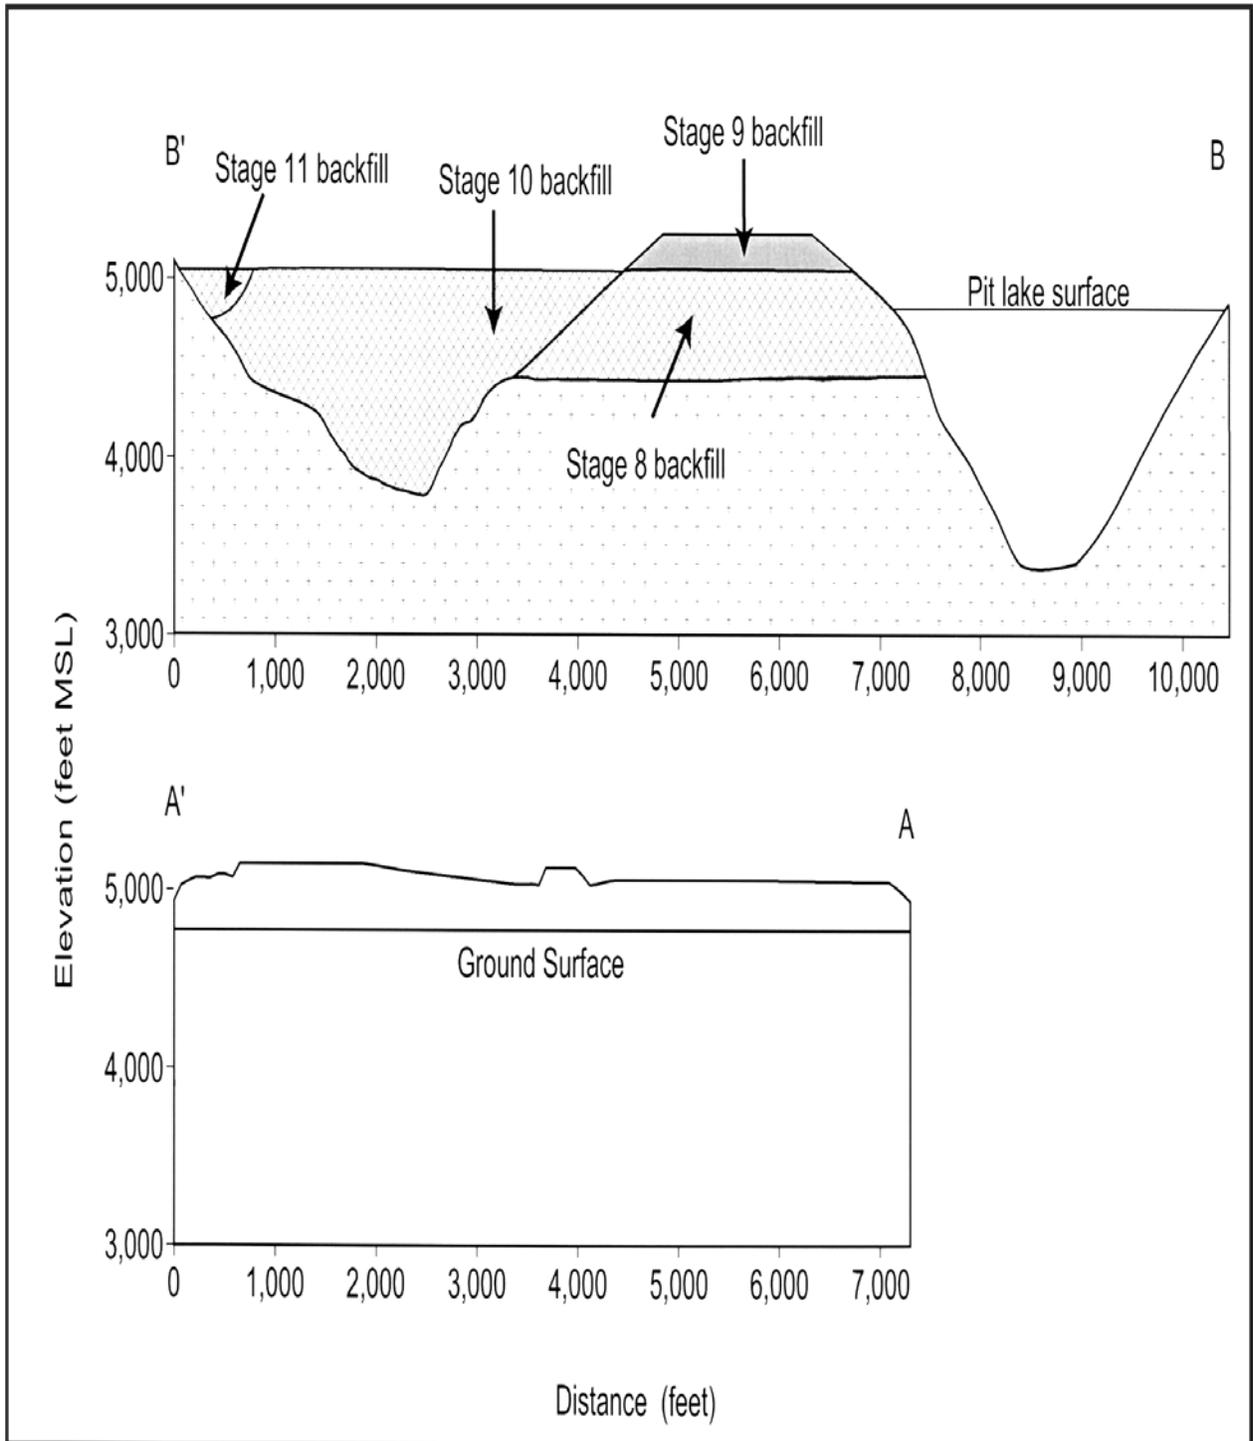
Cross Sections of the Pipeline/South Pipeline Expansion and Stage 9 Waste Rock Dumps
